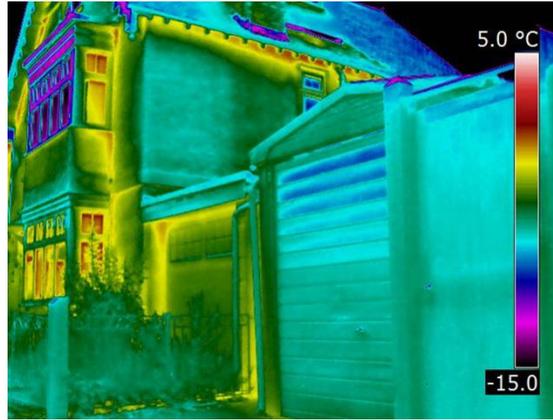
Solid wall dwelling, possible heat loss to eaves and corner junctions. Line of internal wall insulation visible at upper level.
